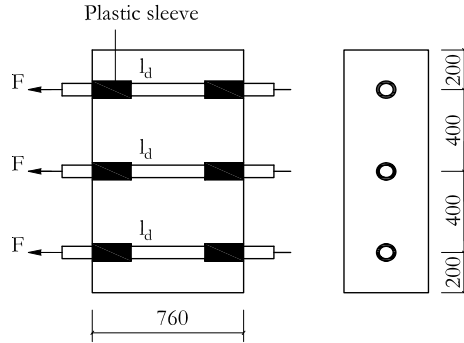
Pull-out specimens used in [36] (units in mm).
